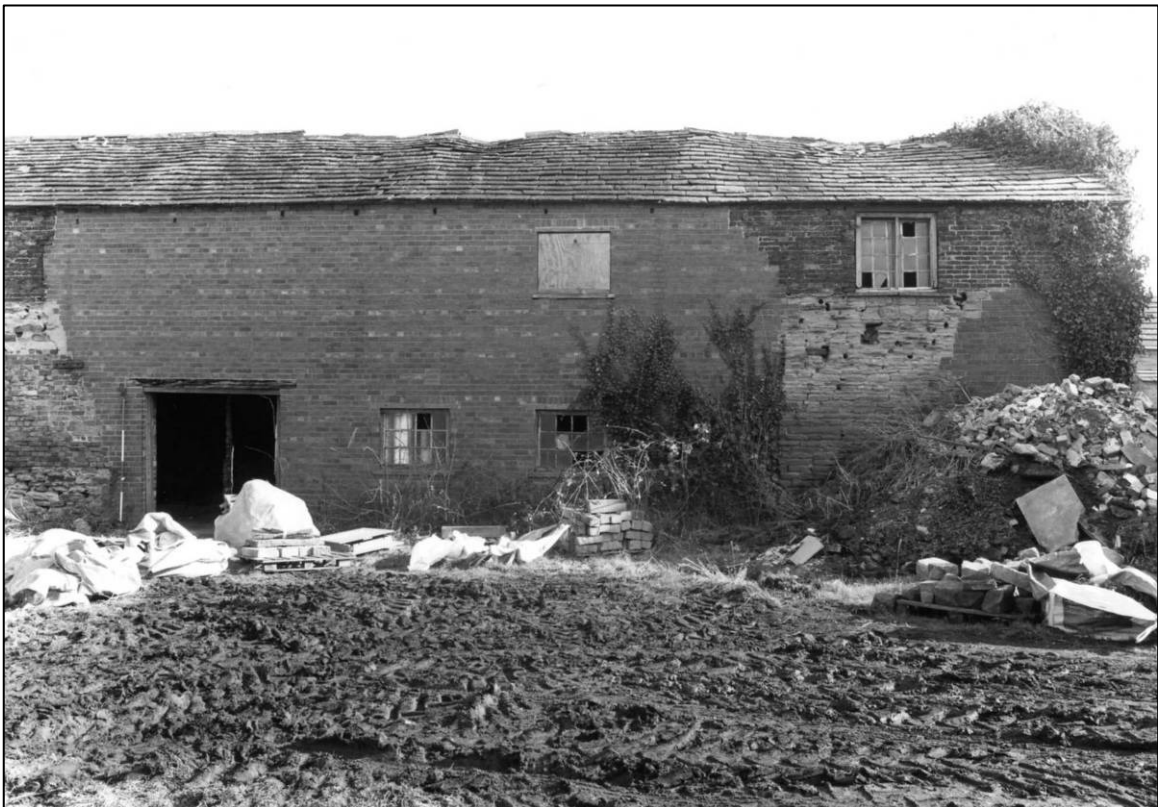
East barn range, W elevation, S part, looking E (photo 1/15).
